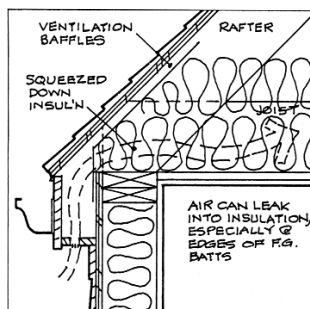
When the eaves are at floor level, the rafters squeeze the insulation just where you want it thick to prevent ice dams. This also invites air from the roof ventilation system into the ceiling insulation.
